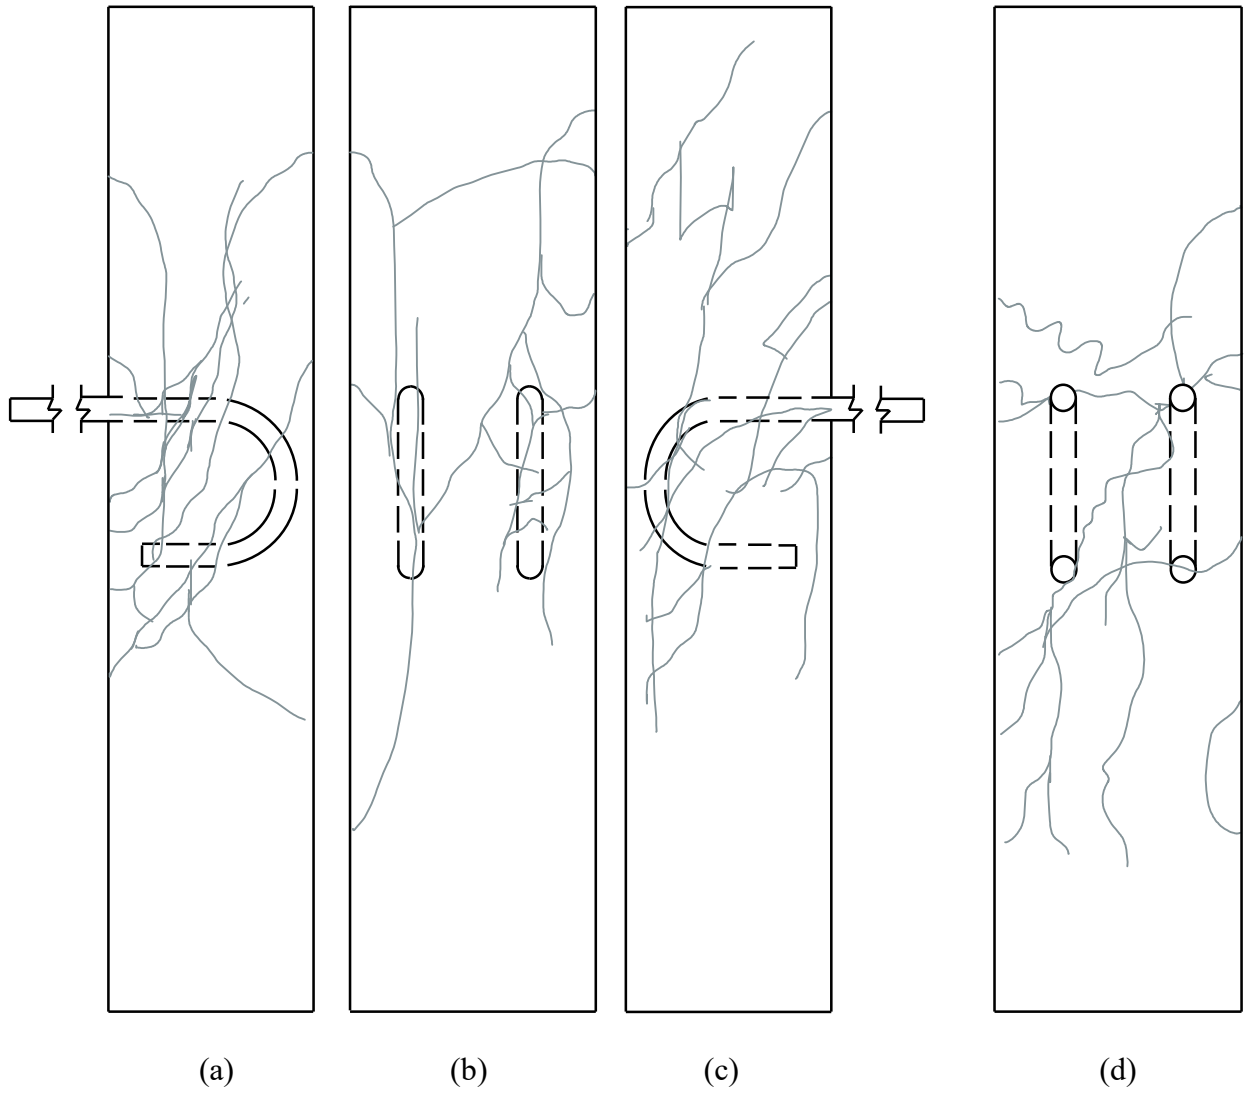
Crack pattern at maximum normalized tensile load for beam-column joint specimen P3-180: (a) west side face, (b) back face, (c) east side face, and (d) front face
